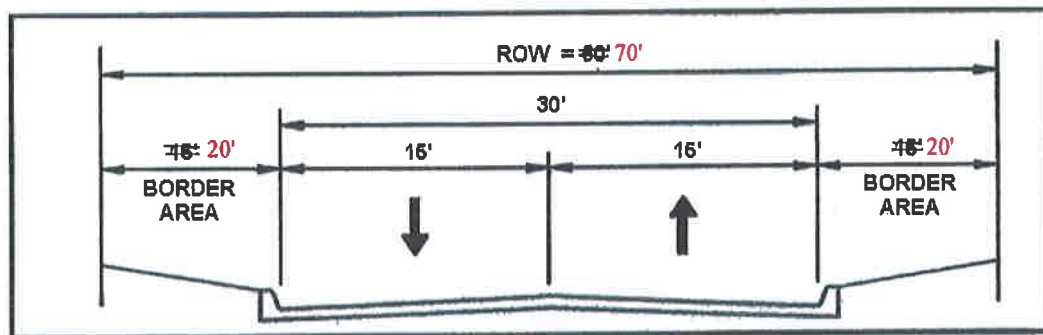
Typical Roadway Sections for Collectors – Alternative 3.
